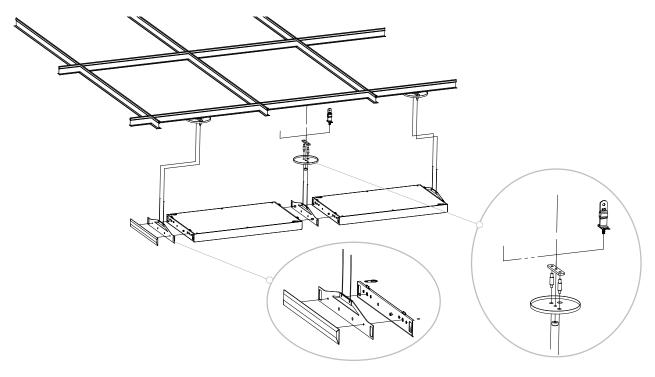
Horizontal Pendant Mount System for Concrete or Gypsum Board Ceiling
